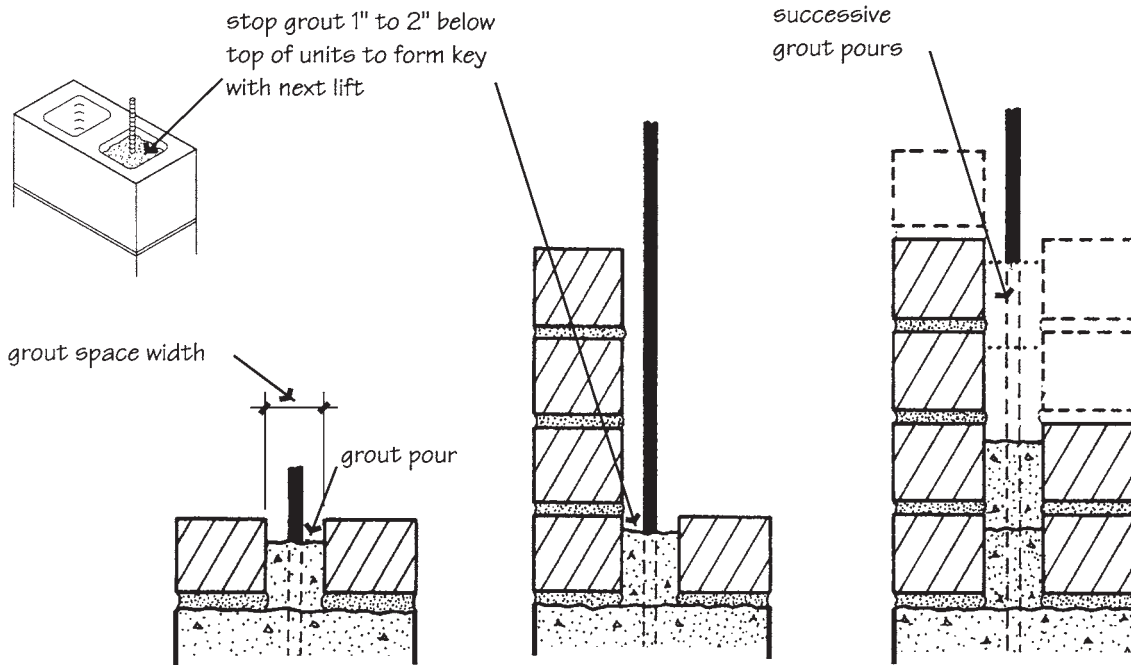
For small projects, grout may be placed as the masonry is laid in lifts not to exceed 12 in. in height. (From Informational Guide to Grouting Masonry, *Masonry Institute of America*, 1992.)
